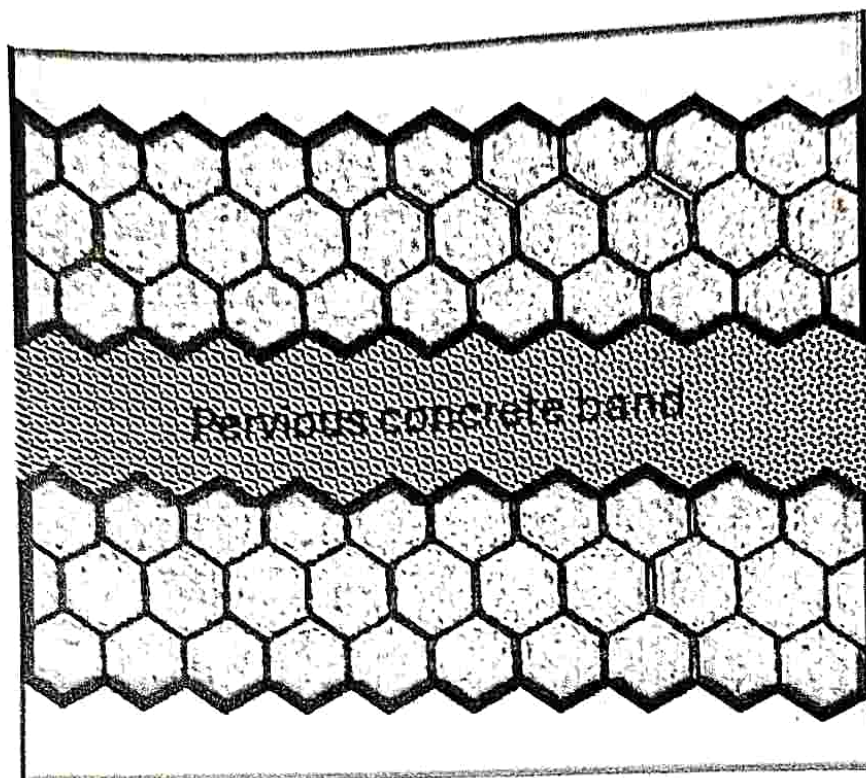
Schematic plan view of existing hexagonal clay-based paver blocks with pervious concrete band
